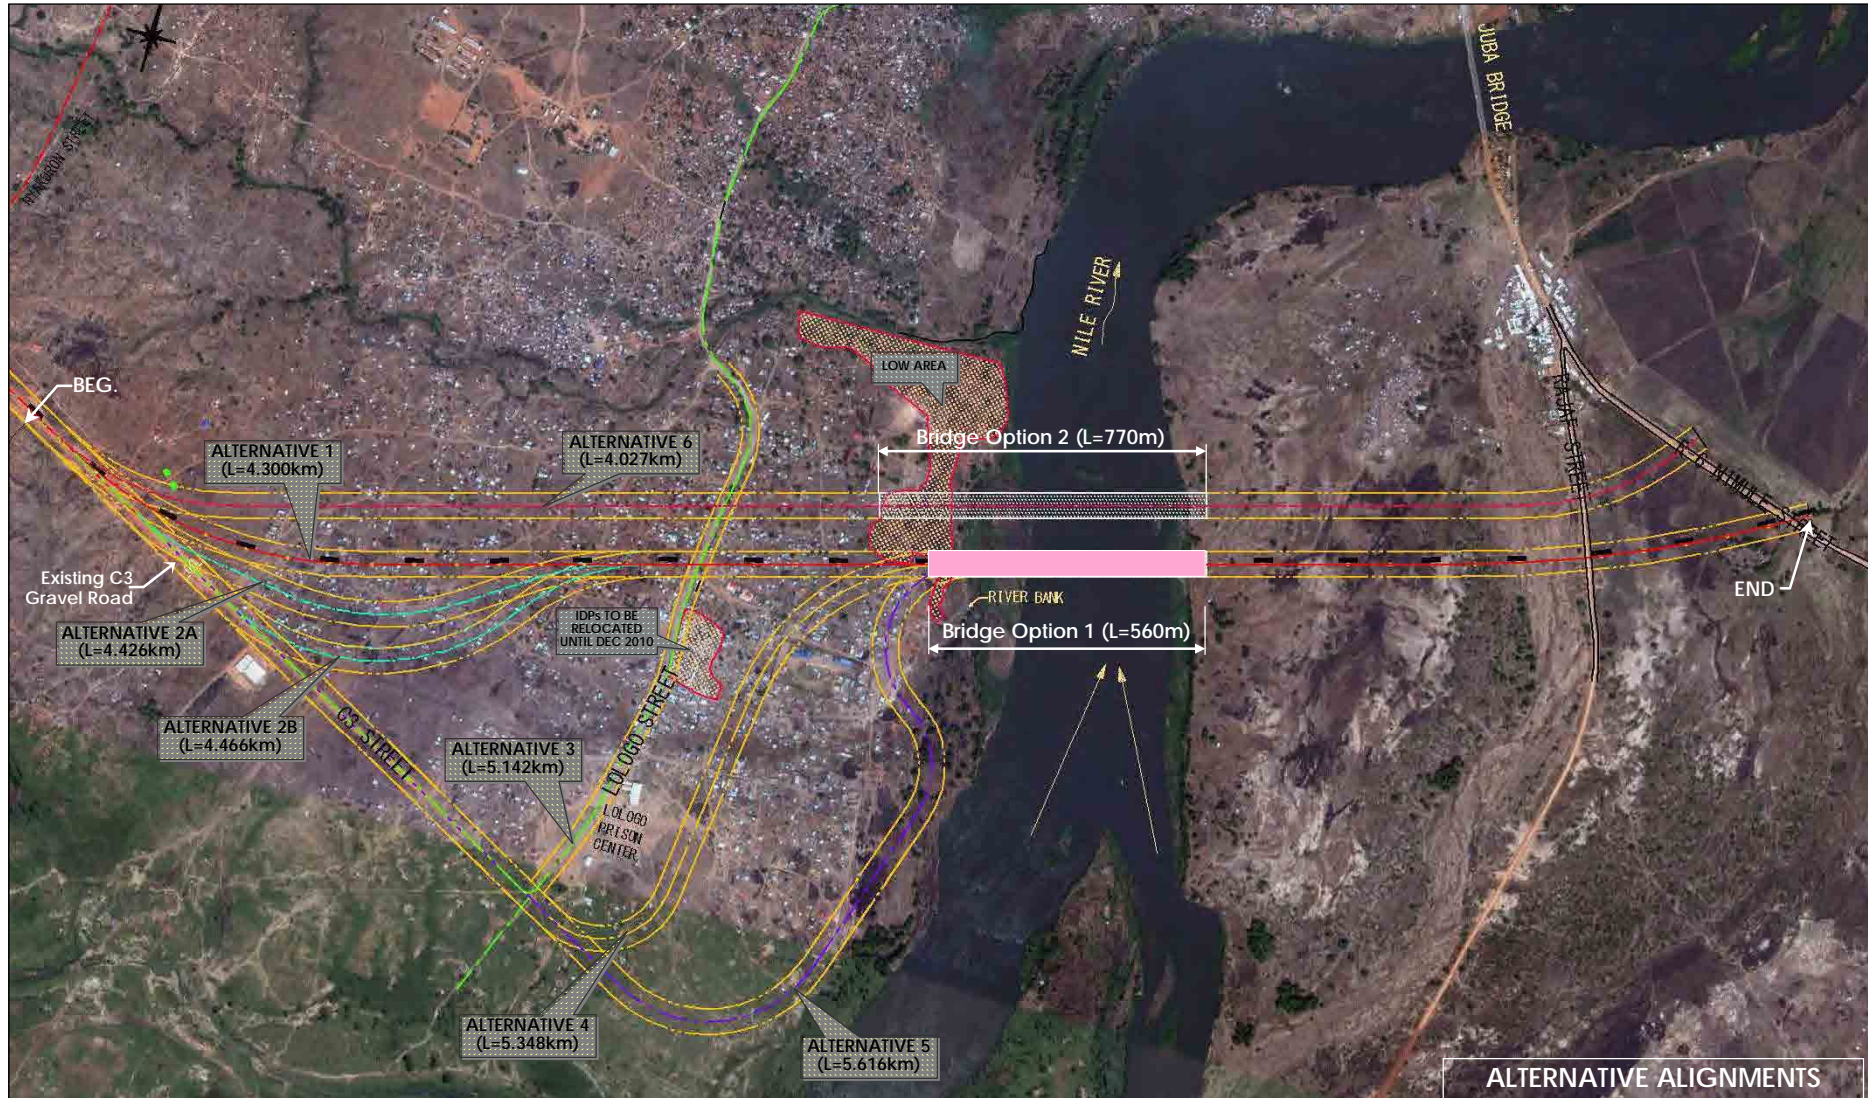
(1) Proposed Project Road Alternative Routes
